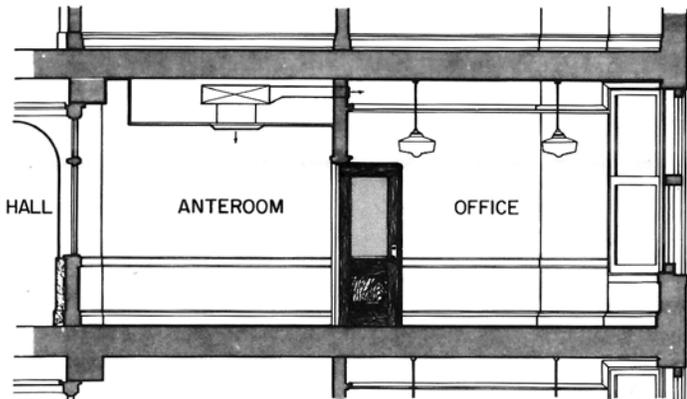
When the Monadnock Building was rehabilitated, architects retained the basic floor plan on the upper floors consisting of a double-loaded corridor with offices opening onto it. The original floor-to-ceiling height in the corridors and outside offices the most important spaces was maintained by installing needed air conditioning ductwork in the less important anterooms. In this way, the most significant interior spaces were preserved intact. Drawing by Neal A. Vogel
